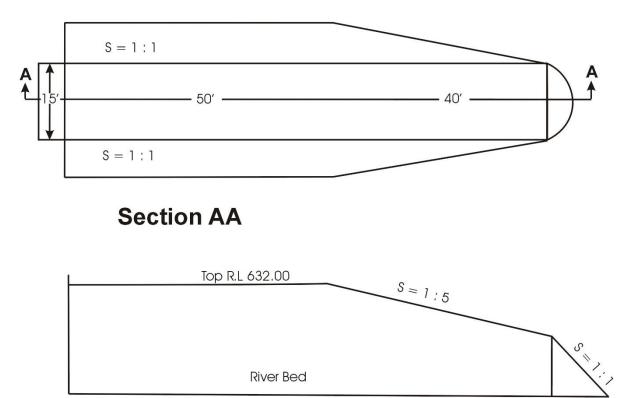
Cross-Sections of Studs 1 & 2 at Sikdey Muradwala
